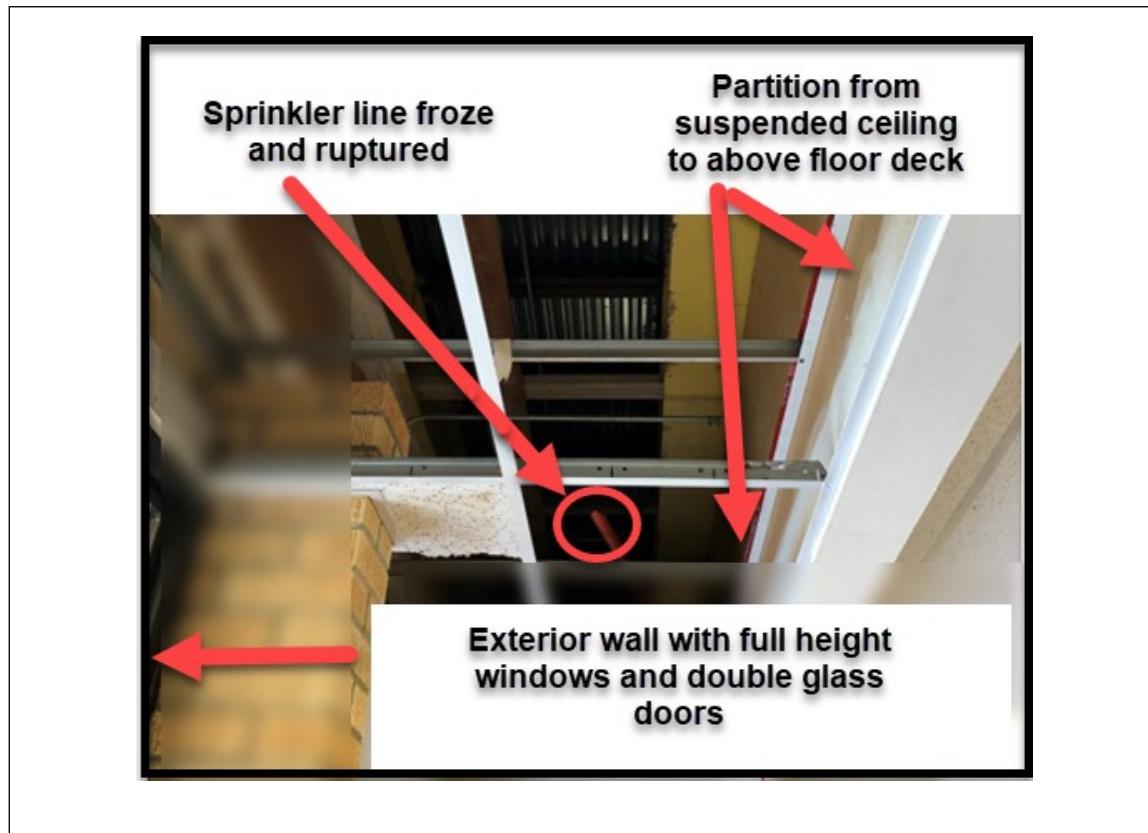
Frozen/ruptured sprinkler line above suspended ceiling
